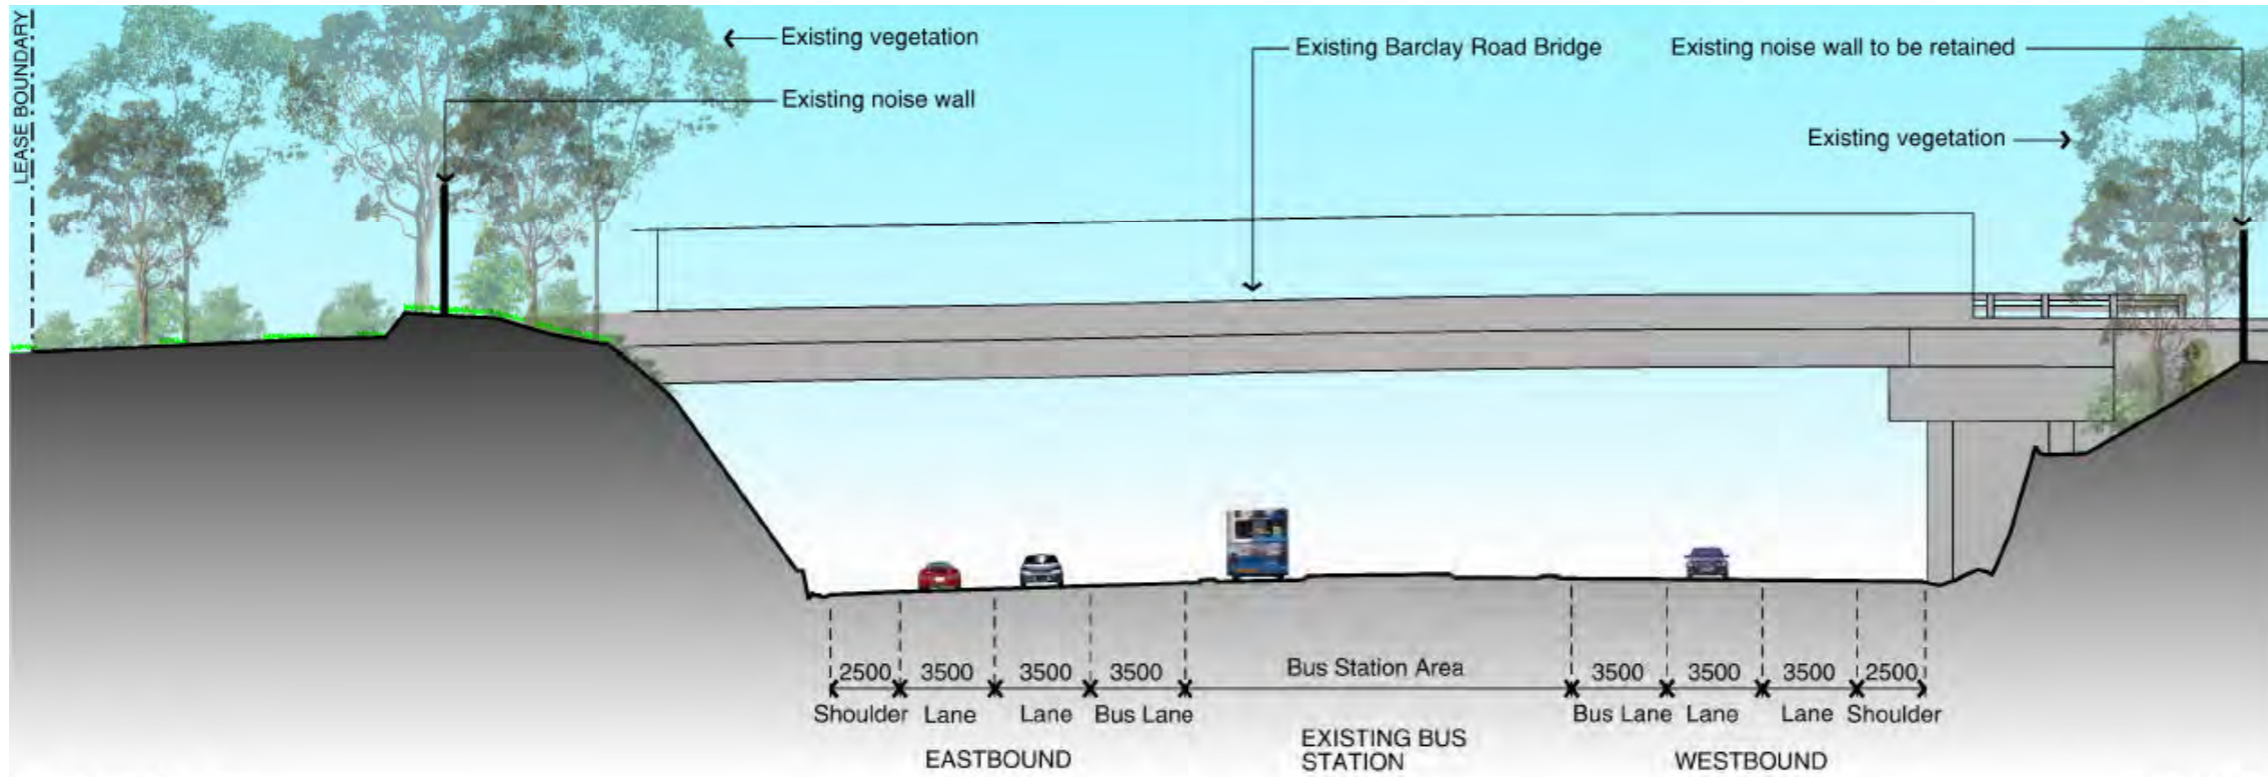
Stn 5550 Barclay Road Bridge - Existing
